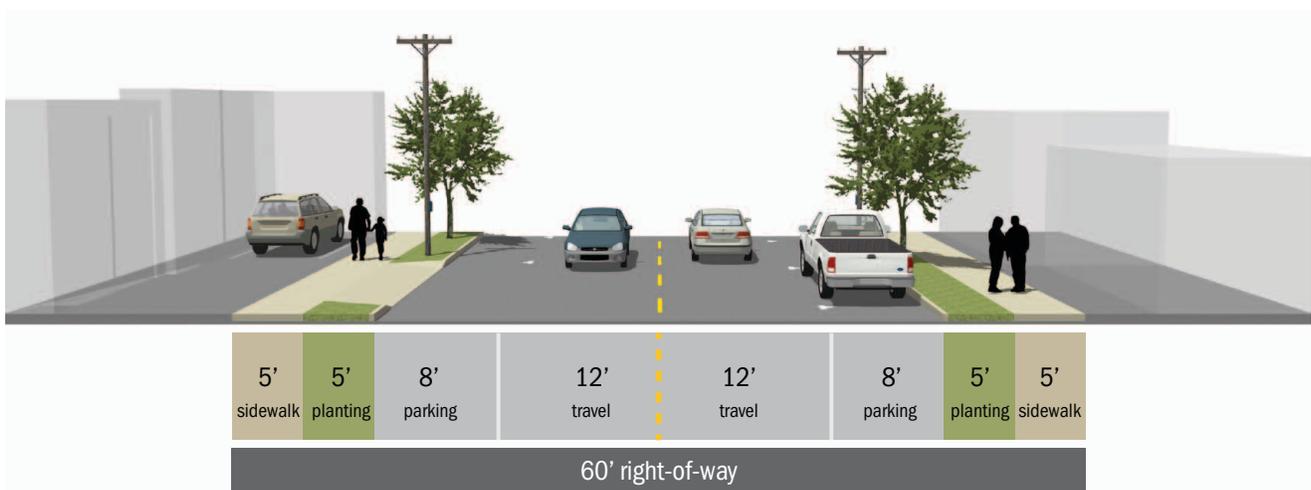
Proposed Conceptual Cross-Section for General Industrial Streets South of Mailwell Drive
